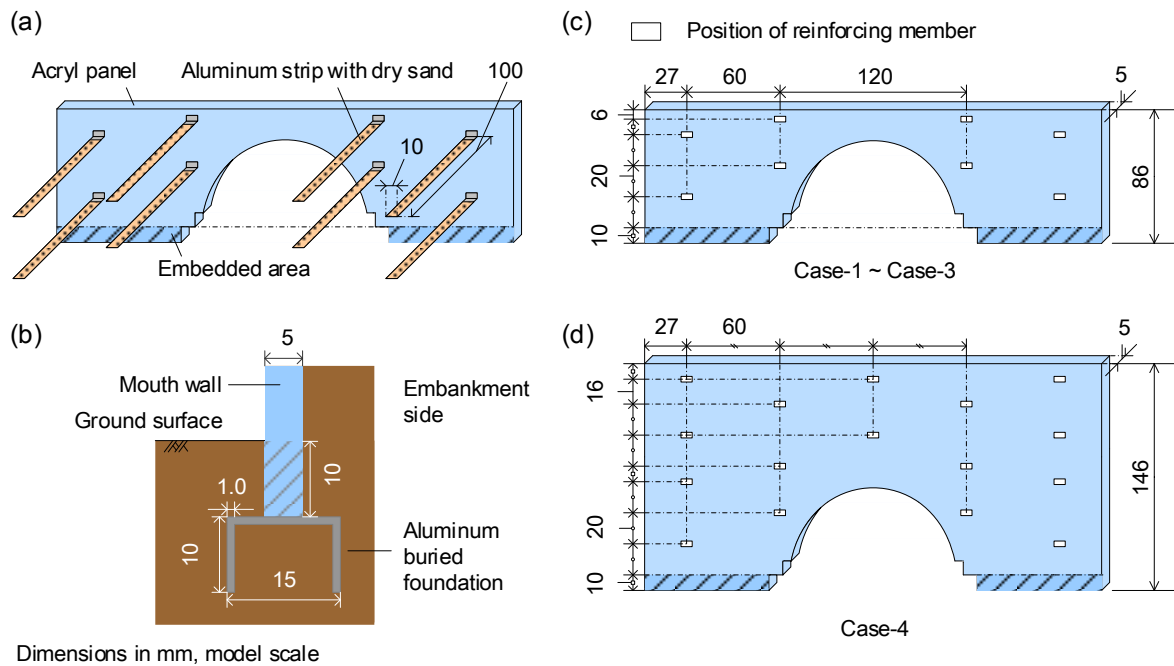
Schematic drawings of (a) mouth wall model based on reinforced earth wall, (b) embedment of mouth wall, and (c) arrangements of reinforcing members in Cases 1-3, and (d) in Case-4.
